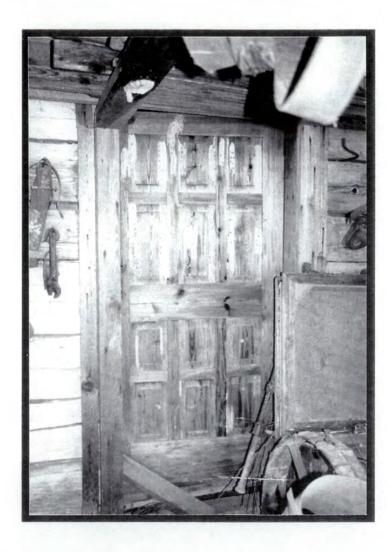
SAMUEL BROWN HOUSE (#9), NORTHWEST REAR ELEVATION DETAIL
